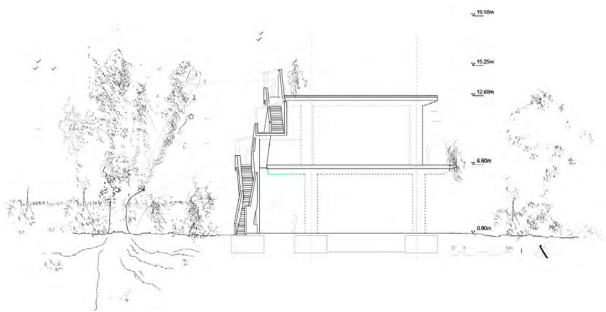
Exterior stairs and concrete skeleton structure section near the existing trees (drawing by the author).
